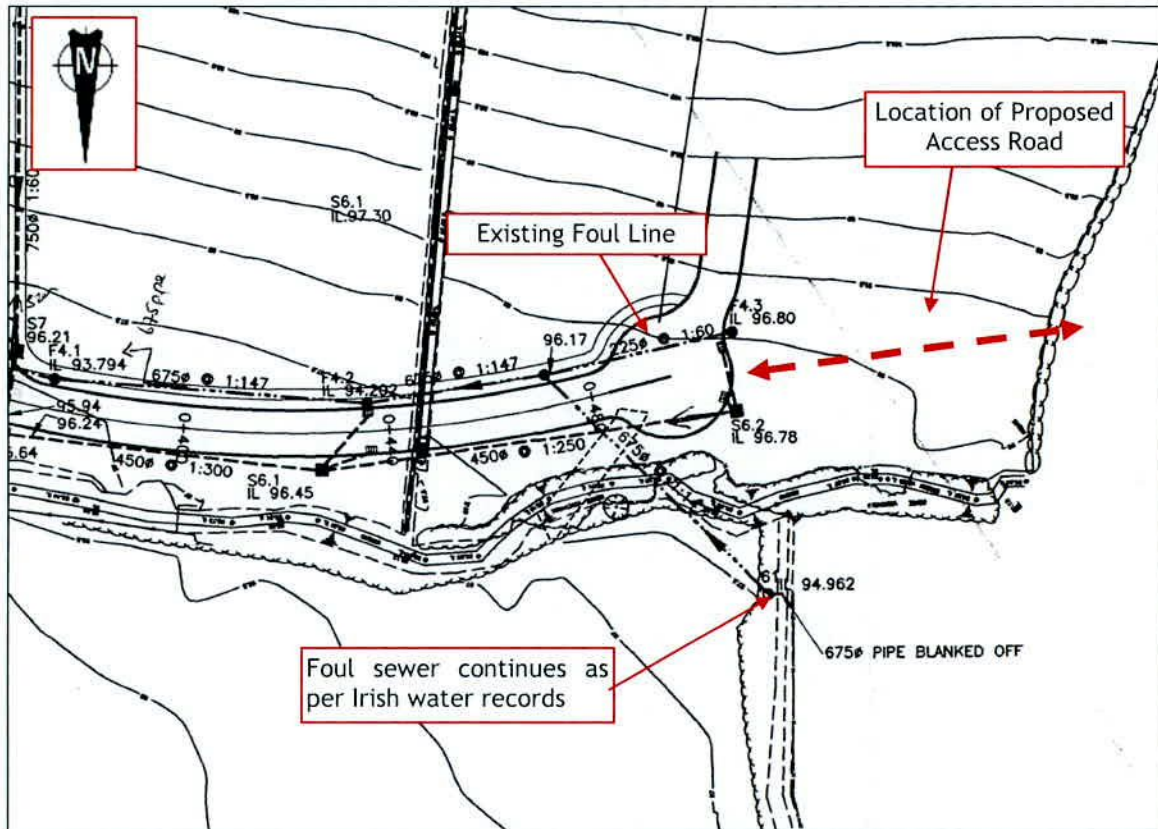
Existing foul drainage surrounding the site (Extract from ROD Site Survey)
